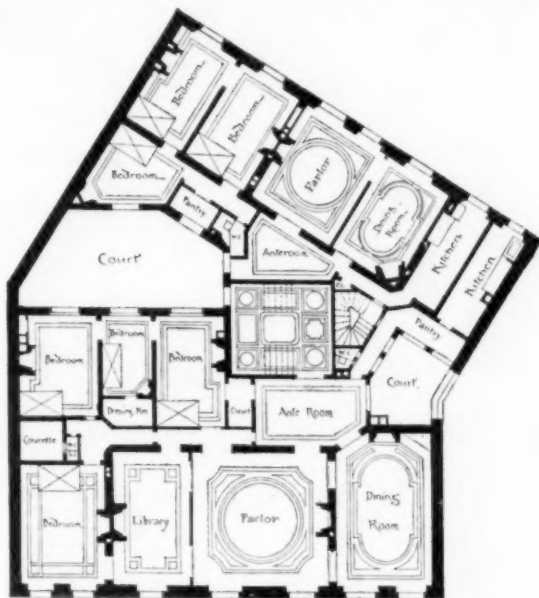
Apartment-house in Paris. MM. Lemonnier & Vergnon, Architects. Plan of Upper Stories: After *La Construction Moderne*.
